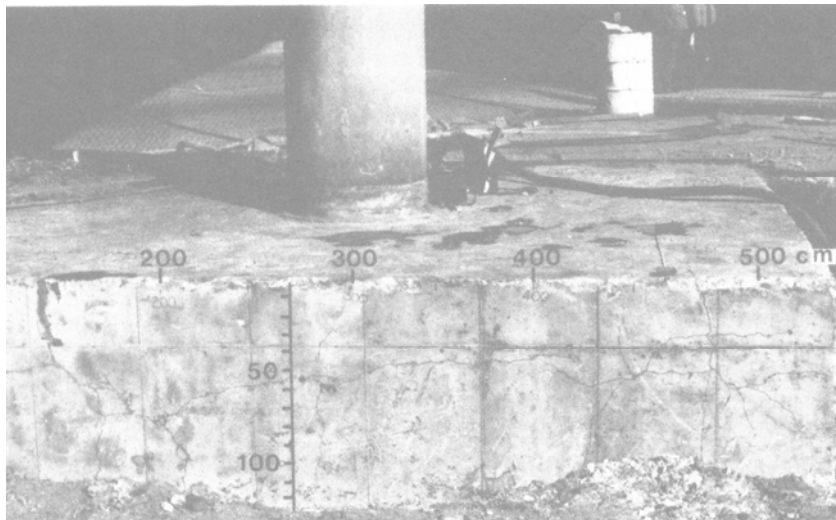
Concrete cracks caused by ASR expansion ((Vanderstraeten 1987)
